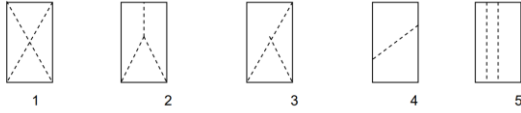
Concrete Crack Pattern (SNI 1974 : 2011, 2011)
